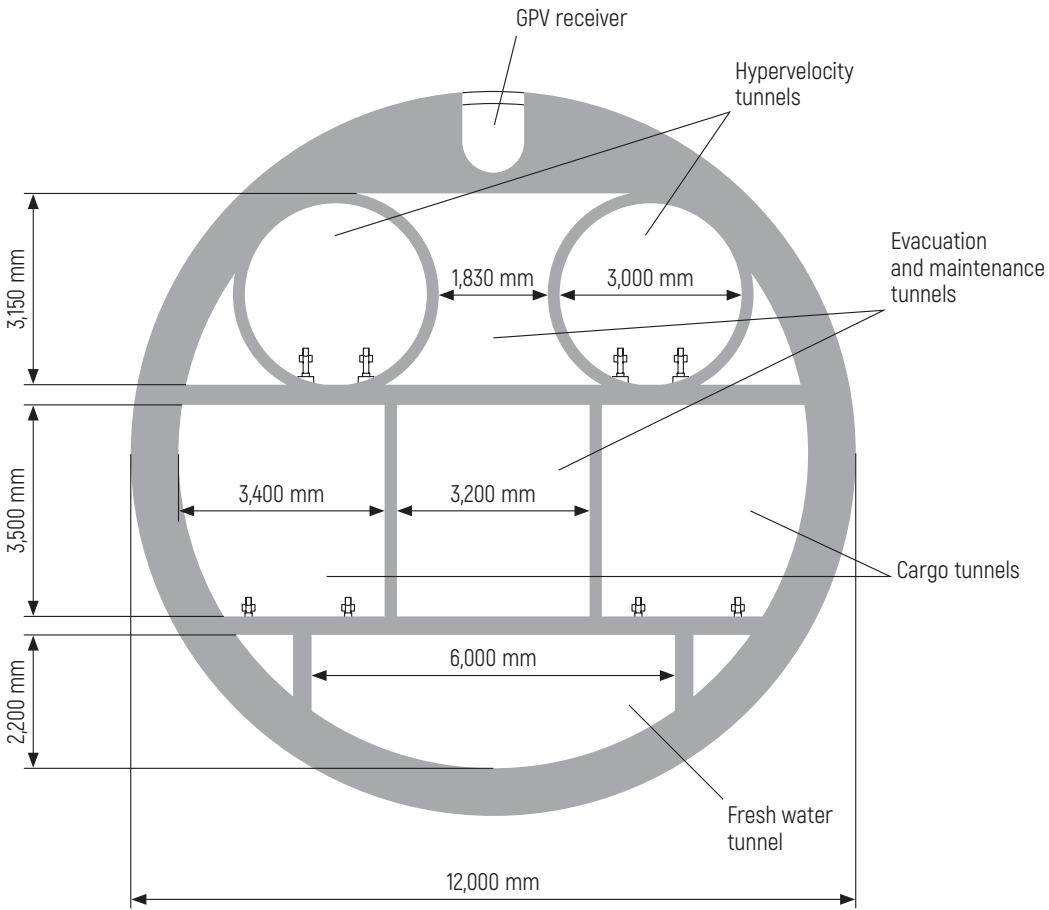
Variant of layout solution to the ocean section of the submerged floating overpass in the inter-span section
